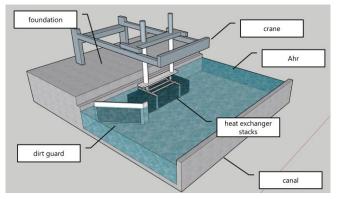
CAD drawing of the heat exchanger and the crane system.
